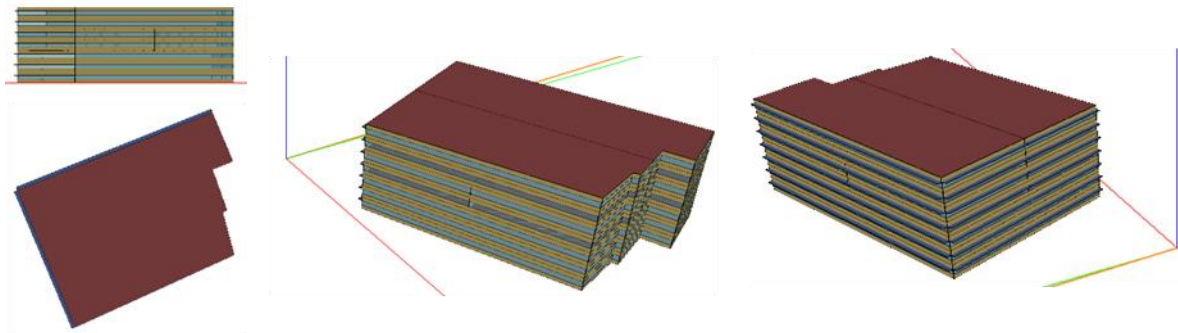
3D Model of Case Study Building with HVAC Installation
